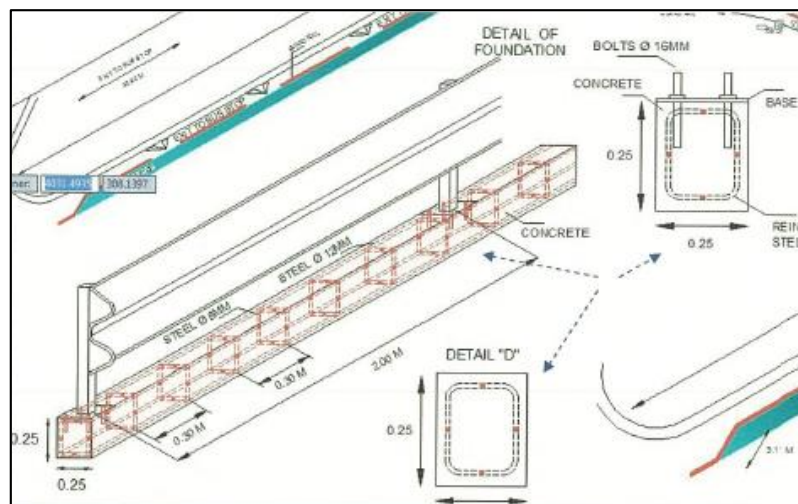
Cross section and reinforcement plan of curb stone and the plan of assemblage of guard rail
